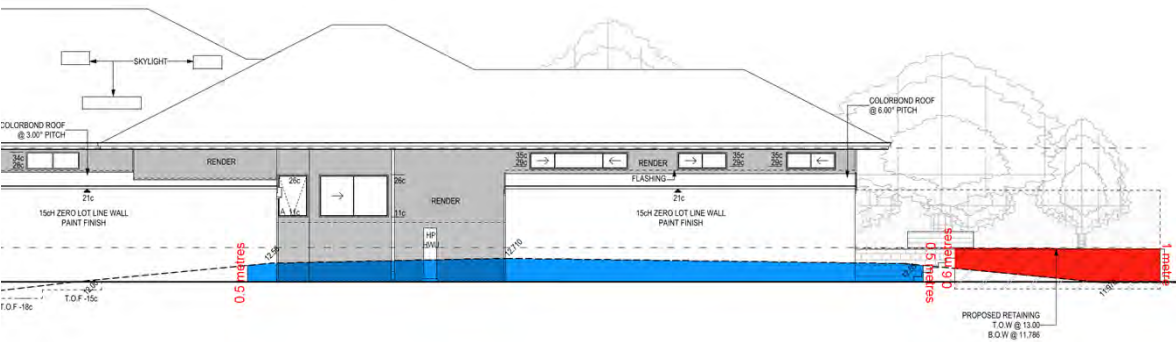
South elevation of excavation greater than 0.5m in blue, 0.5m retaining/infill in red.
